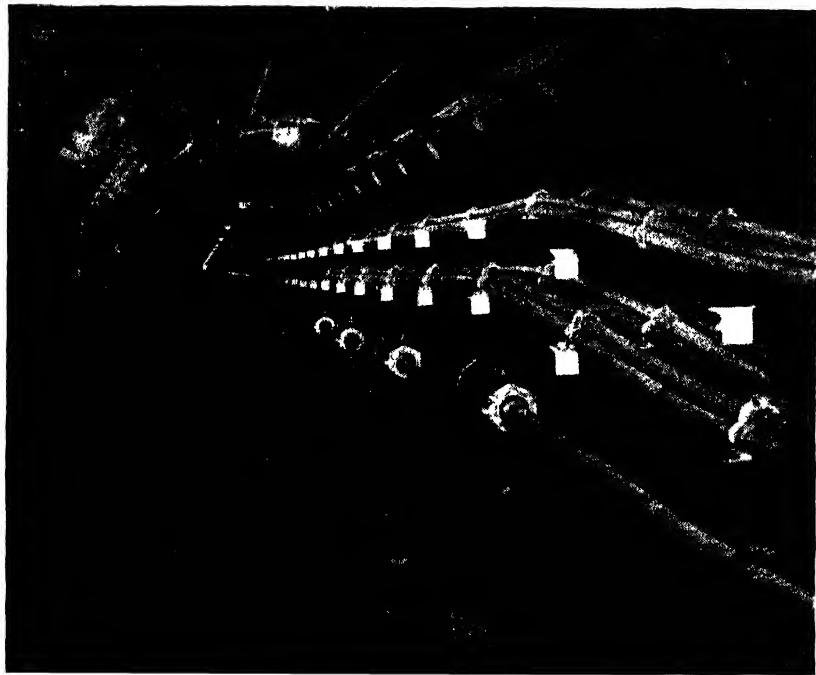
Main Cable Tunnel, Battersea Power Station.
